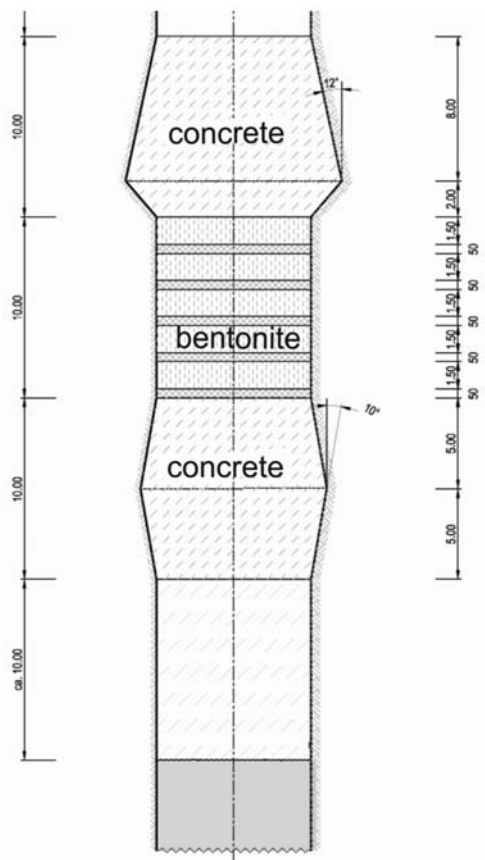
Construction of the layered replacement for dam 59 in the Bockraden shaft with the abutments at the bottom and top and the SANDWICH in between.
